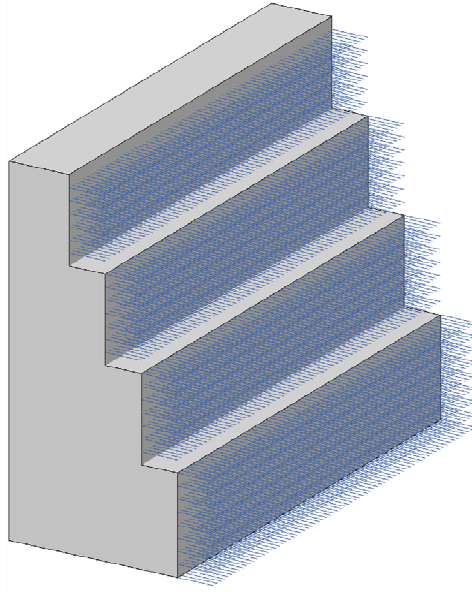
Finite element model of MRLD2 wall with lateral, p-y, backfill soil springs (Note: guide wall mesh, timber piling, and foundation soil springs not shown for clarity)
